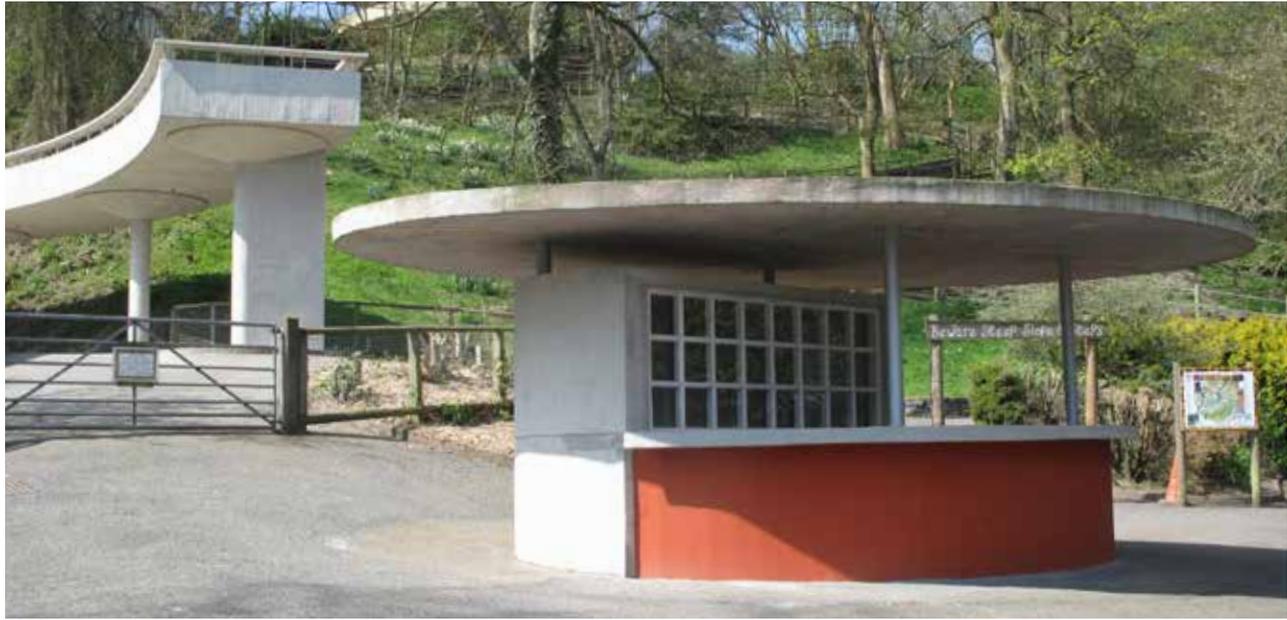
The kiosk with bear ravine behind, following repair works, 2016
